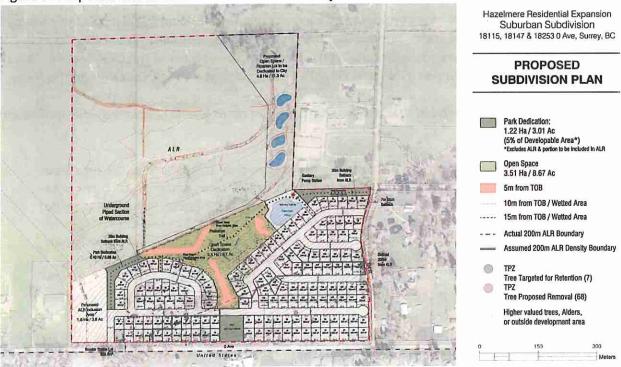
Proposed Residential Lot Subdivision on Subject Site
